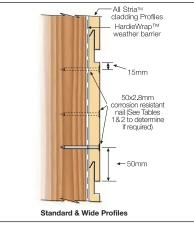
C FACE FIXING GUN NAILS: FOR BOTH STRIA CLADDING PROFILES
